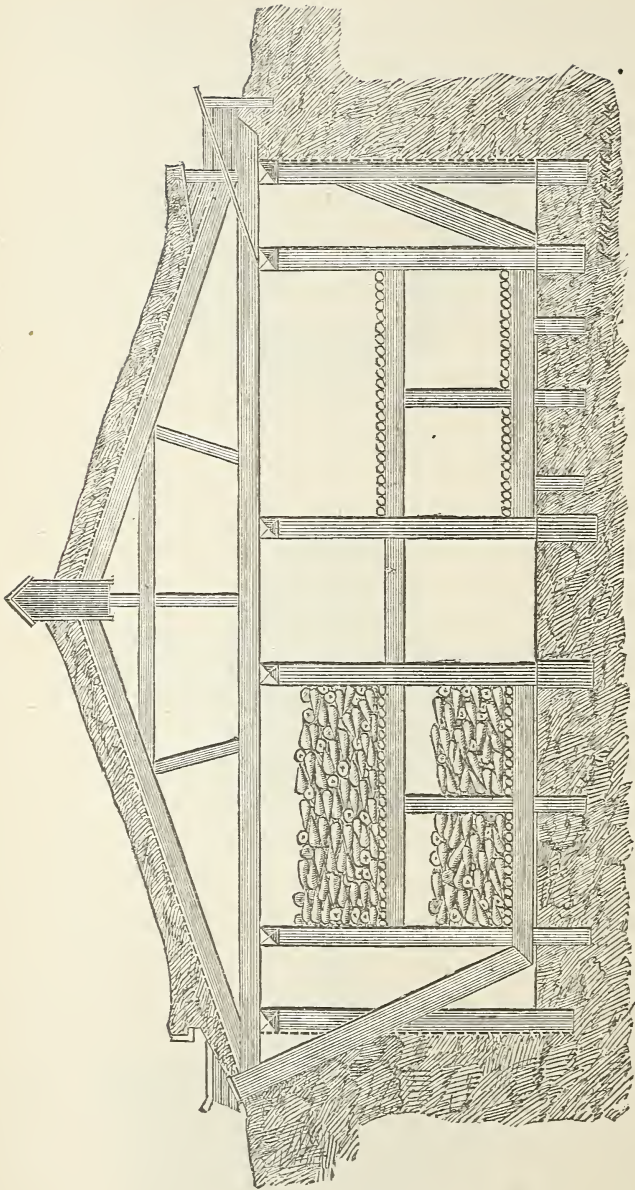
Preserving cellar (Wahlkoff). Russian plan, vertical section.
